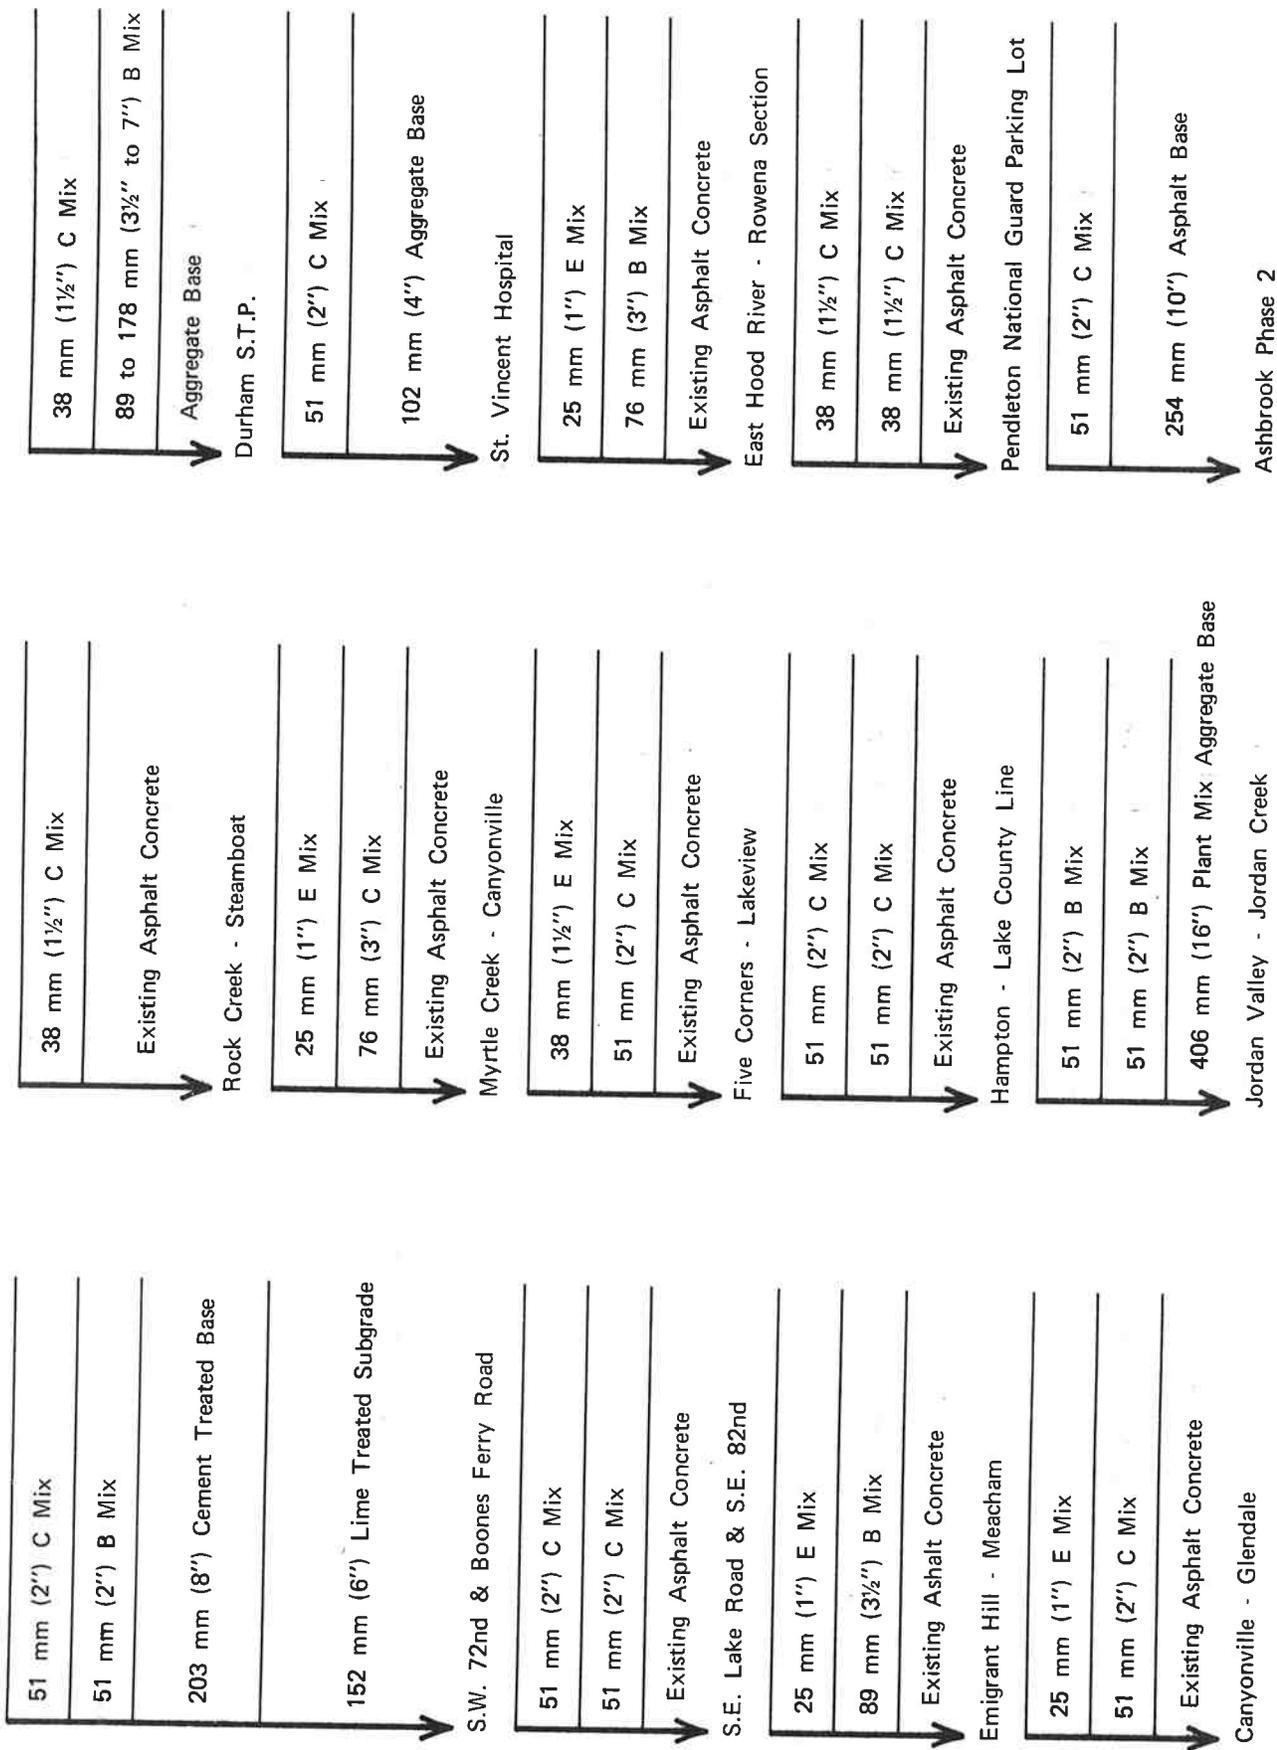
Typical Cross Sections for Pavement Sections Evaluated
